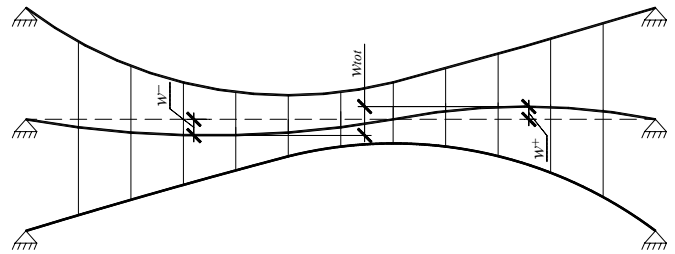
Deformed shape of prestressed suspension bridge in non-symmetrical loading case
